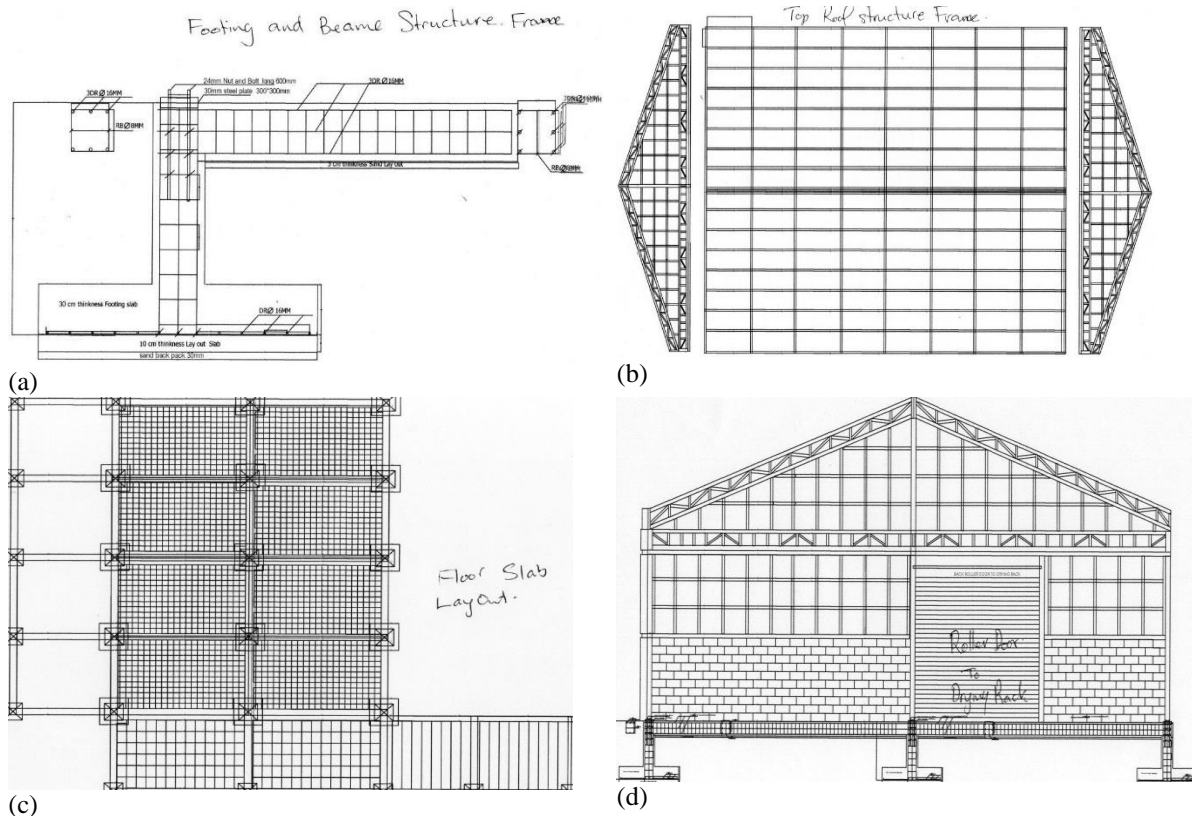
Examples of technical drawings including the foundation pier and beam structure (a), roof structure (b), foundation post and reo-bar structure (c) and a side wall (d).
